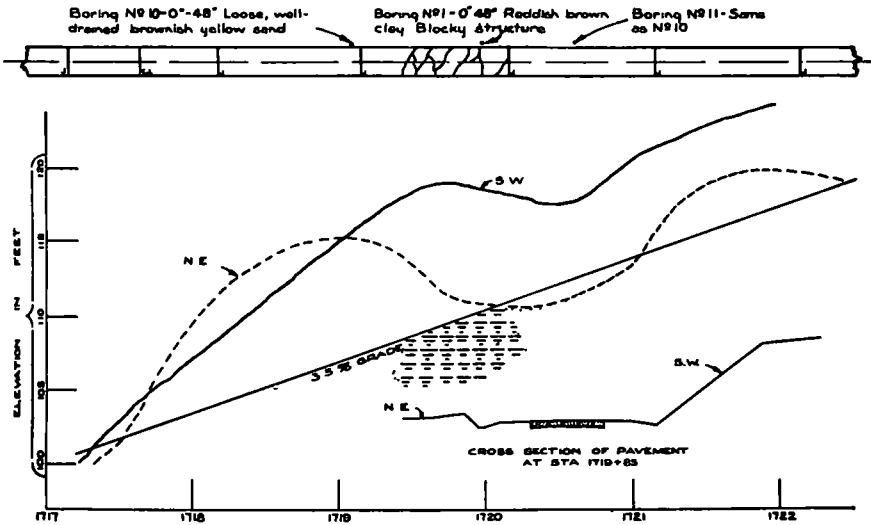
Frost Heave in Clay Pocket Responsible for Pavement Failure
